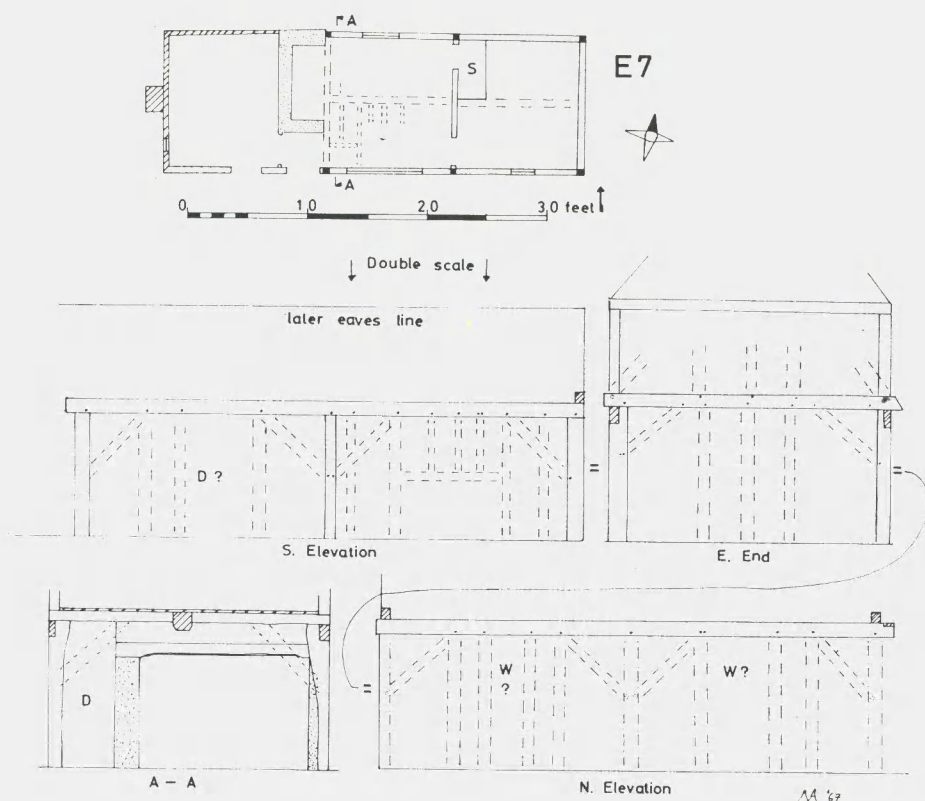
E7: Plan, elevations and sections. W = window, D = door, Shading = brick.
